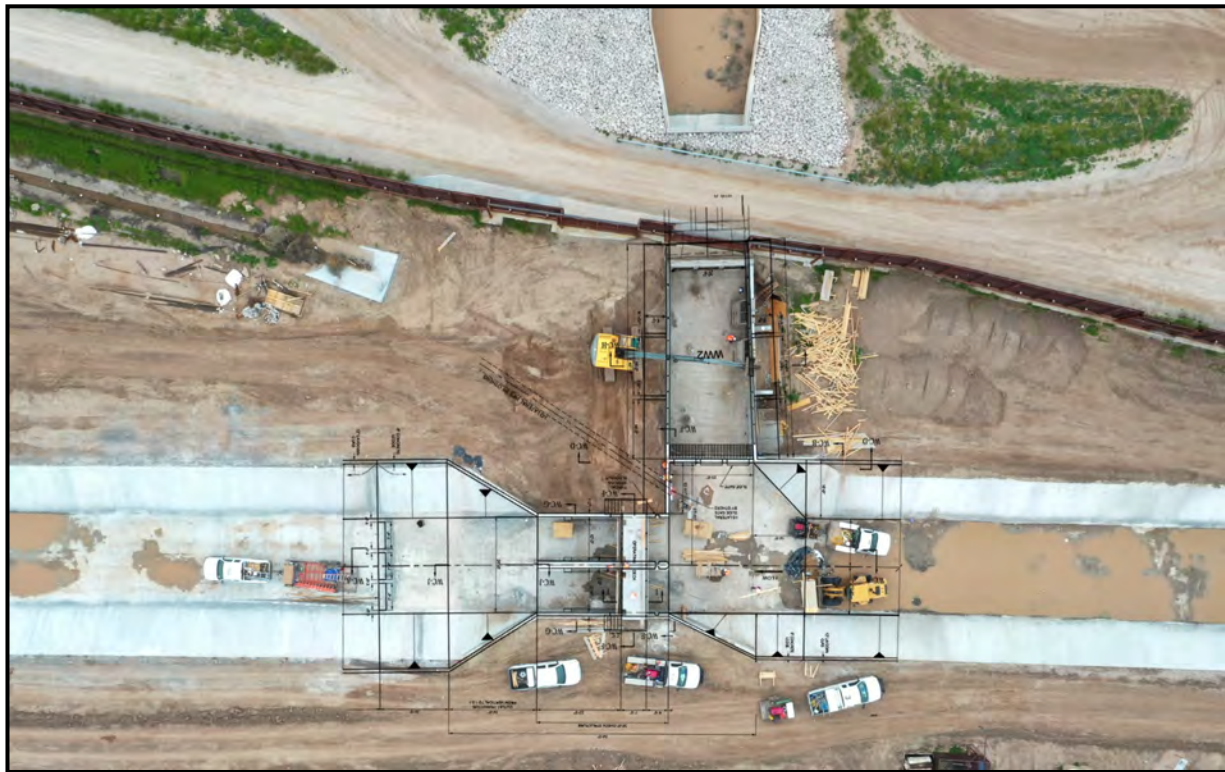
Riverside Canal Wasteway II and Check Structure Design and Construction
